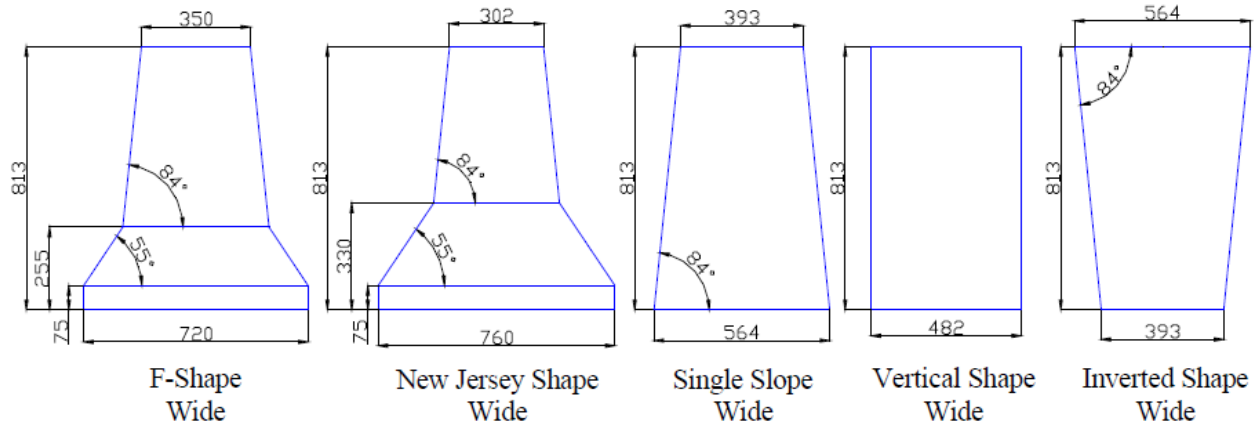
Barrier Shapes – Wide Width (mm) [167]
